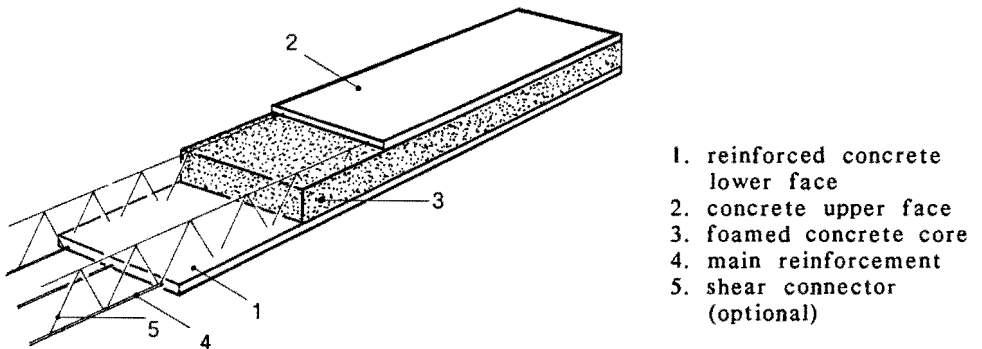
Reinforced concrete sandwich beam with a foamed concrete core.
